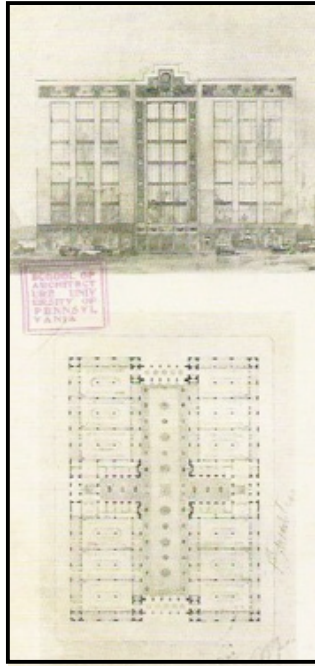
Louis Kahn Elevation and plan of A Shopping Center, 1924 (McCarter, 2005, p.22)
